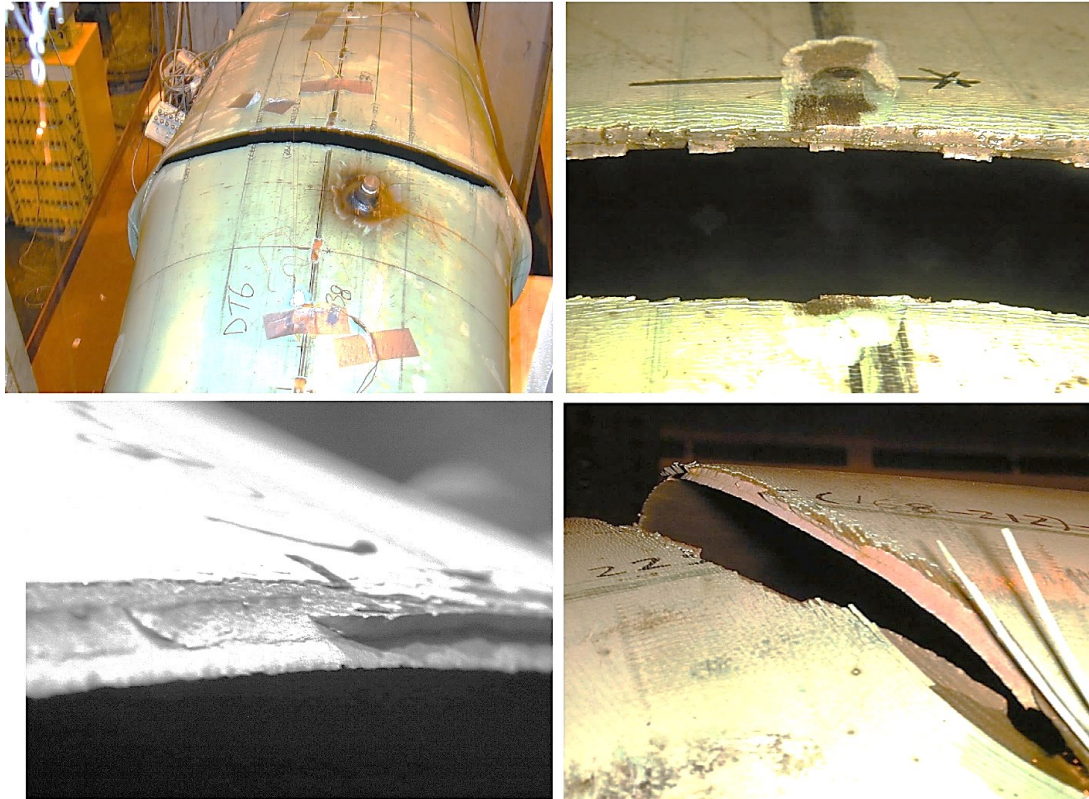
Necking in fibrous fracture surface and crack propagation (Sen 2006)
